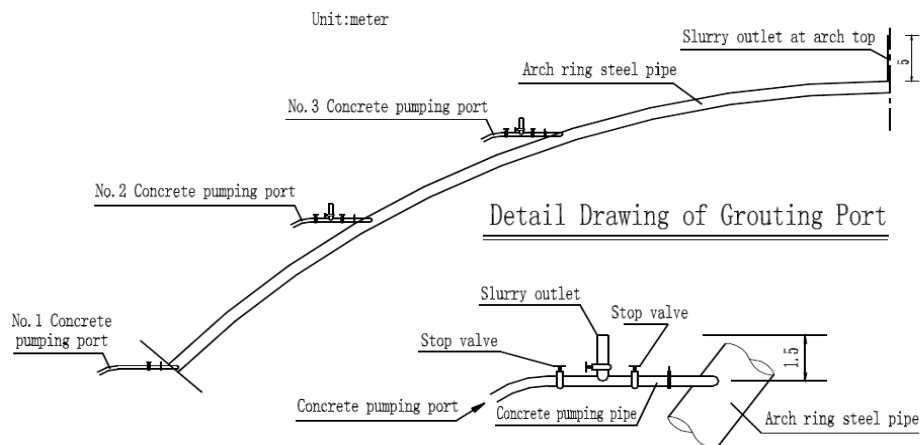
Indication sketch of concrete-filled steel pipe grouting of the main arch (adapted from [14])
